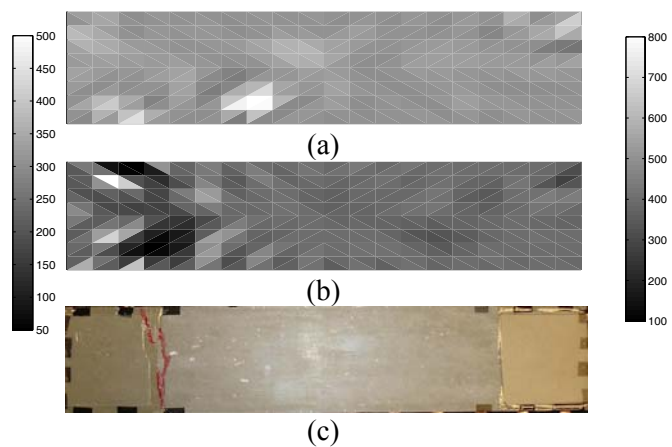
EIT images of Specimen #3: (a) prior to loading, and (b) after damage localization. (c) Damage denoted by red marking.
